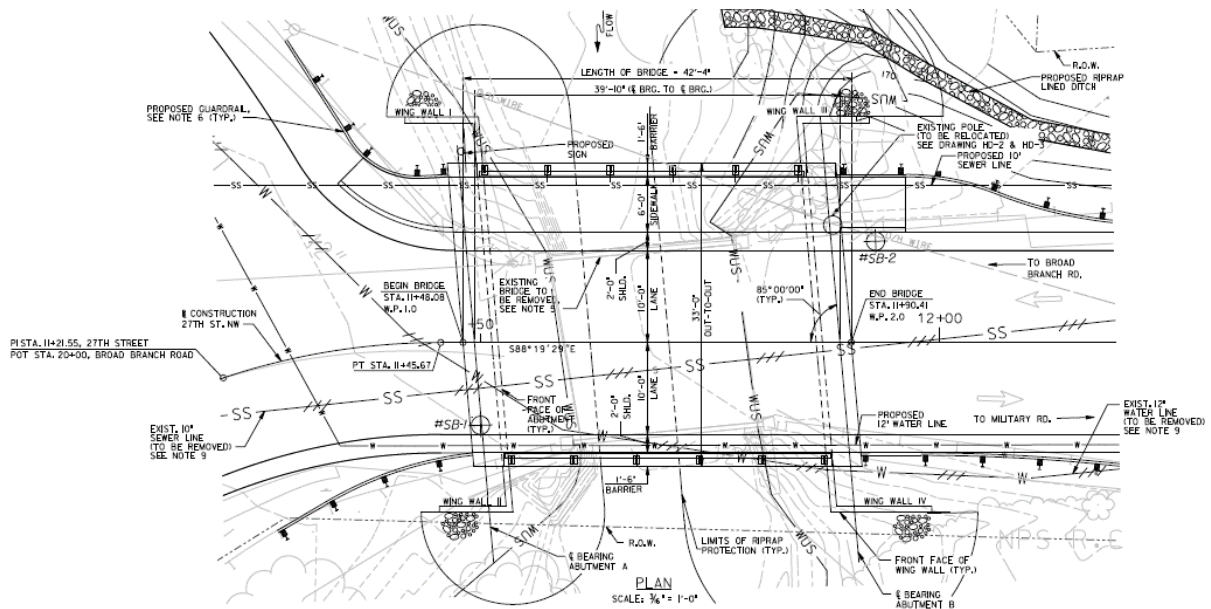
Diagram. Plan view diagram of the proposed bridge.
